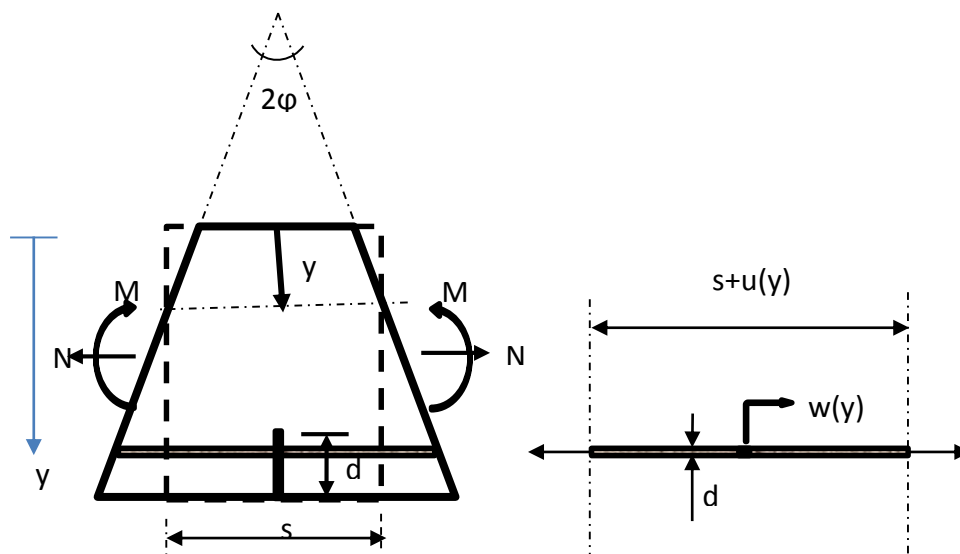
Geometry, Loading, and Deformation of Cracked Incremental Horizontal Strip of Hinge
